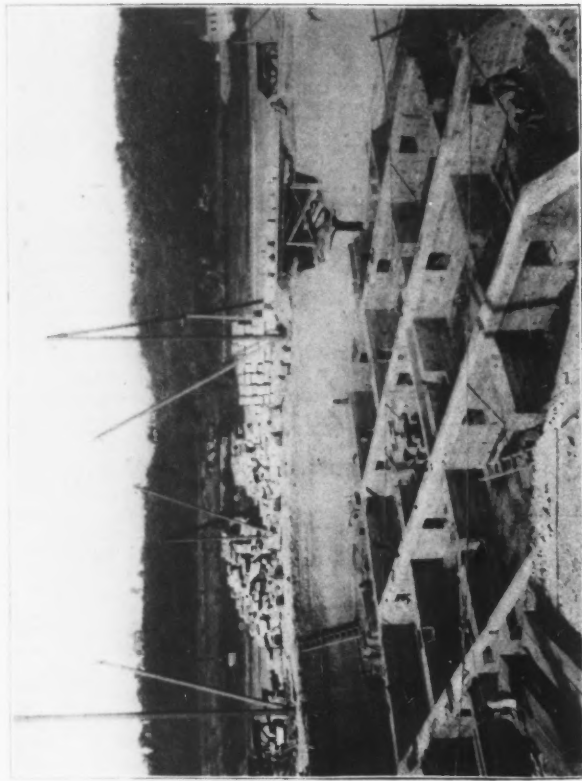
CAISSON WITH STIFFENING GIRDERS OR CELL WALLS NEARLY COMPLETED.
